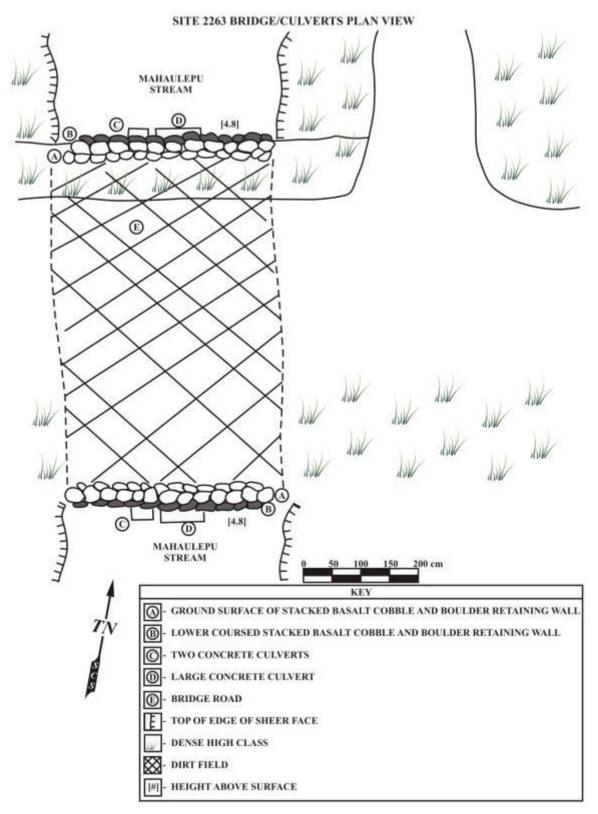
Plan view of Site -2263, retaining walls and culverts.
